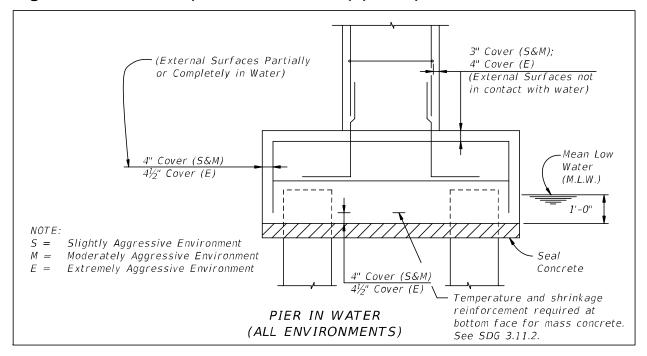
Piers (All Environments) (1 of 3)
